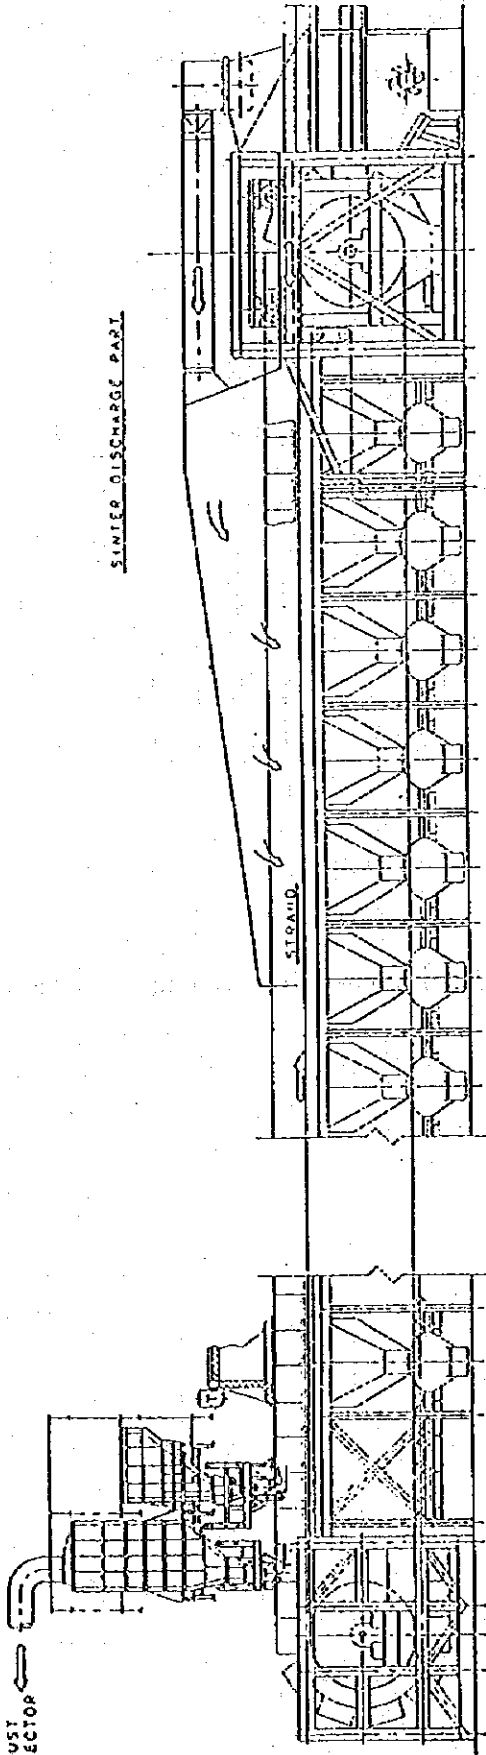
Typical drawing of dust collection in ore feeding and sinter discharging part.
